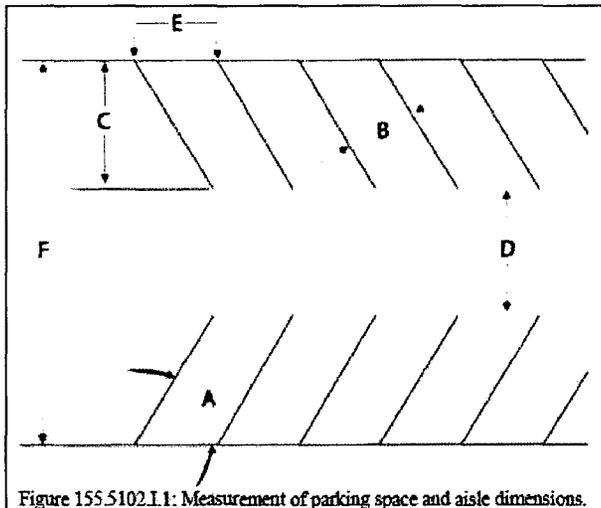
I.1: Measurement of parking space and aisle dimensions
